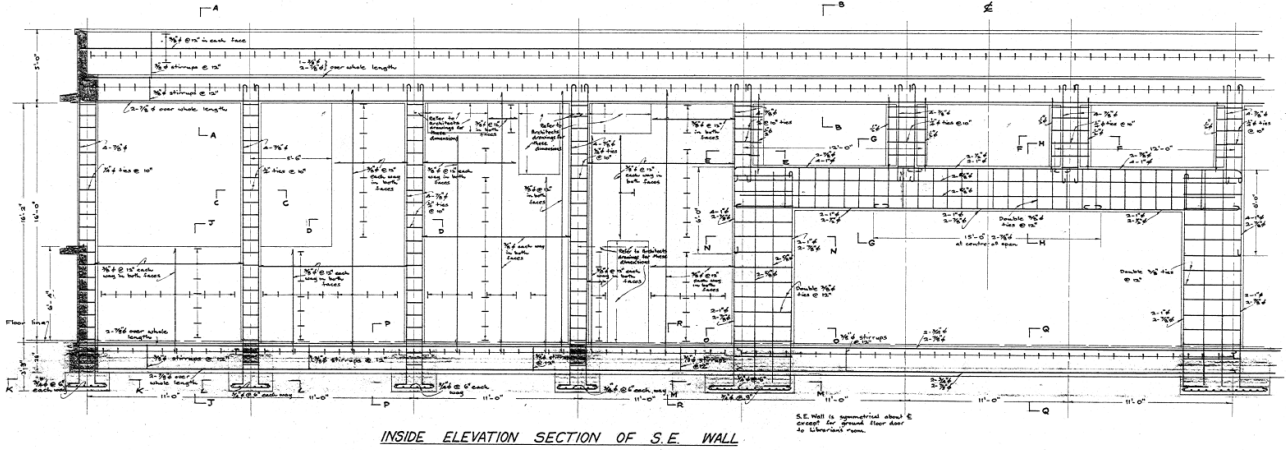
Typical Concrete Moment Frame with Infill Elevation on Library (Grid Line Z)
